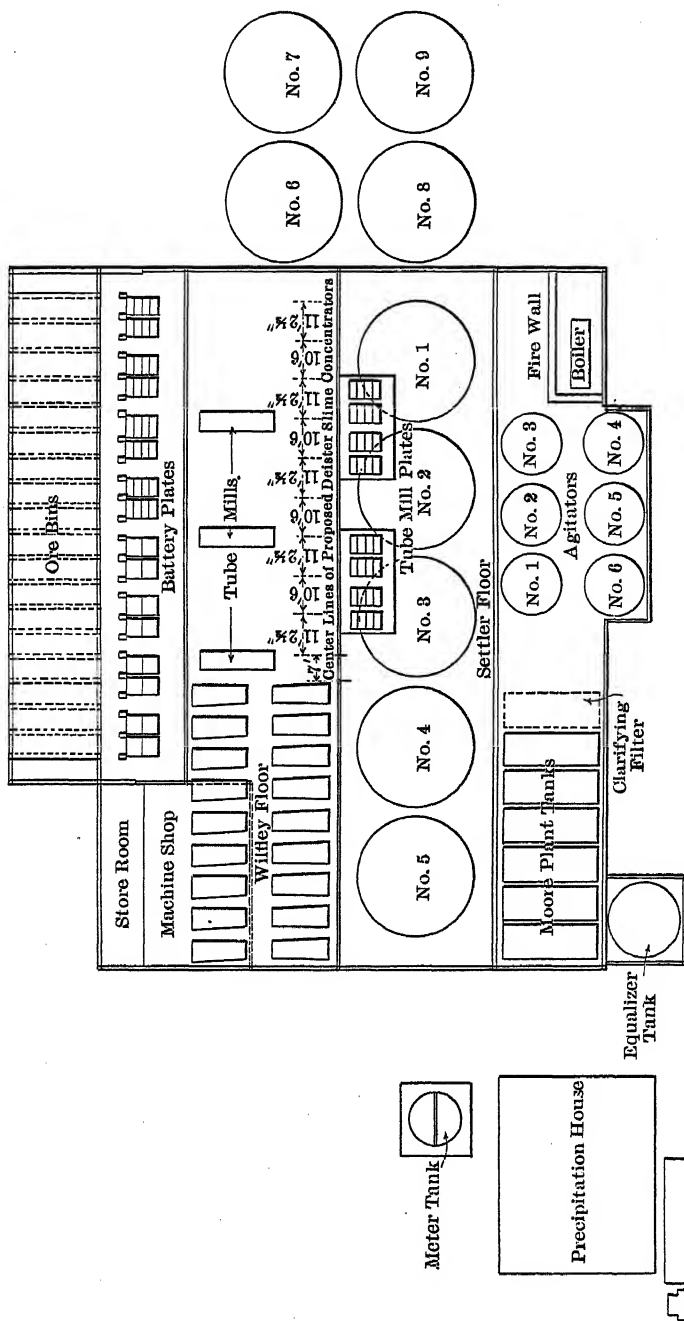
LIBERTY BELL MILL. GROUND-PLAN.
